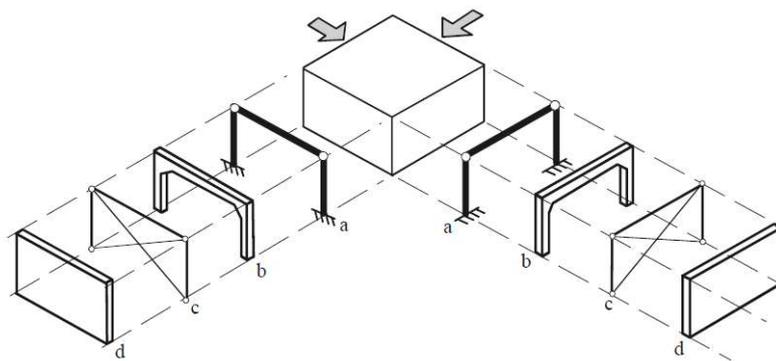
Vertical stiffening elements: a) clamped column, b) rigid frame, c) braced frame, d) shear wall<sup>14</sup>
